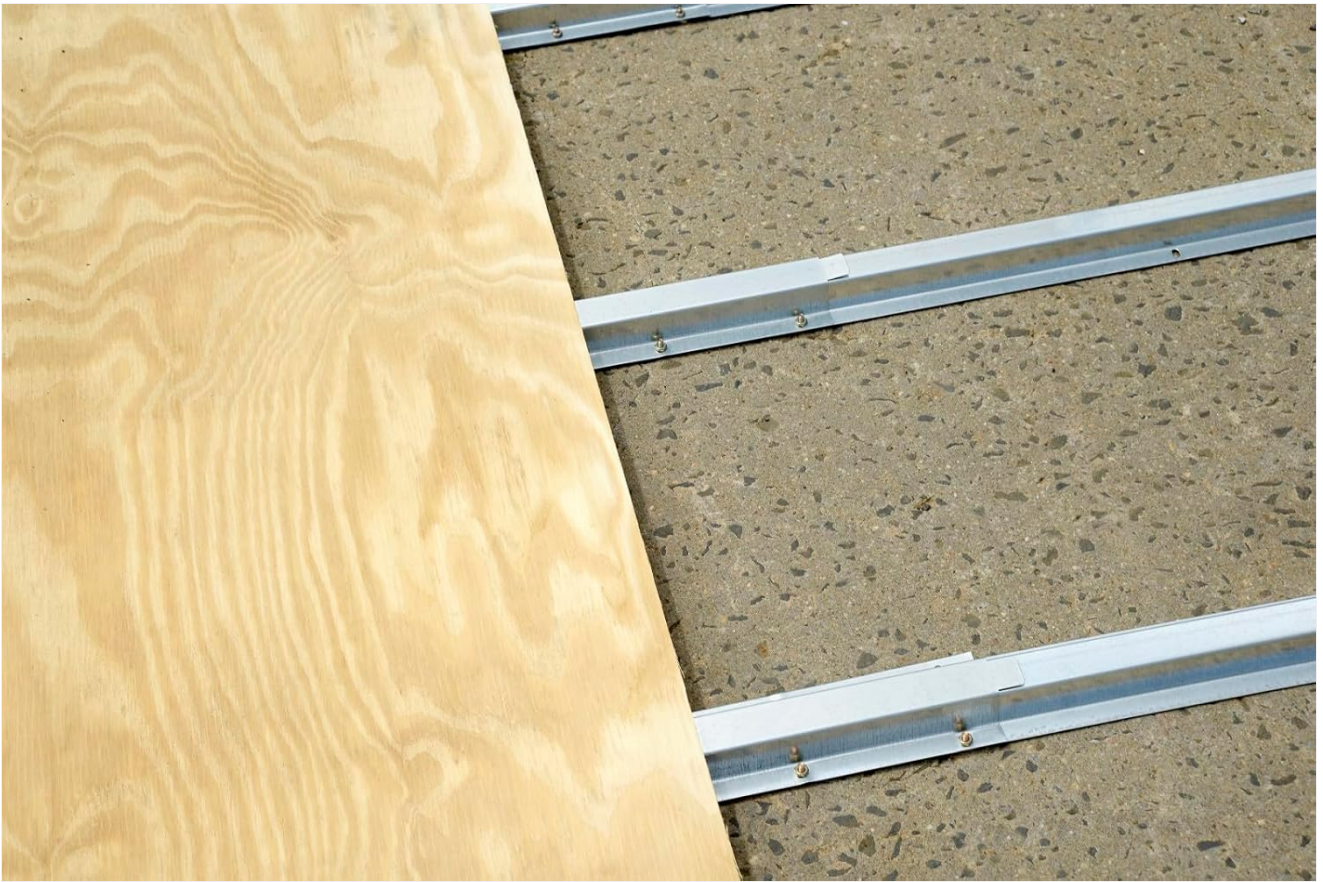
A detailed view showing a section of plywood being positioned over the metal floor frame, which is resting on a concrete surface. This illustrates the process of installing the flooring material.
